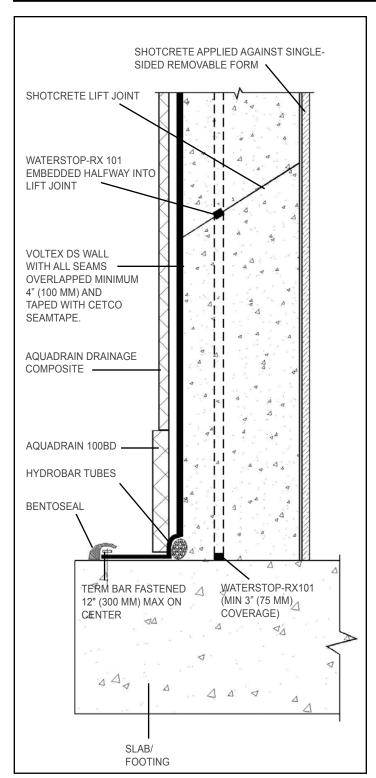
NON- HYDROSTATIC BACKFILLED SHOTCRETE WALL
